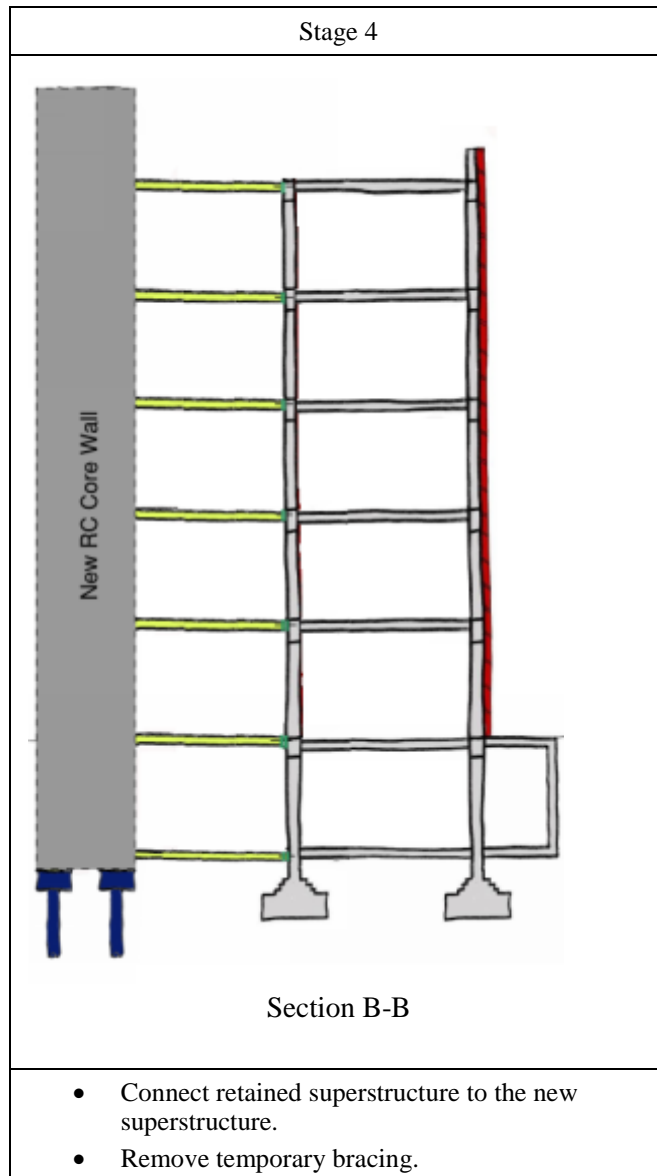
Envisaged 67-69 Whitfield Street façade support arrangement
